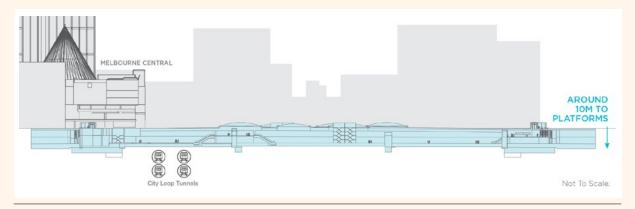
Swanston Street alignment tunnel (Melbourne Metro Rail Authority, 2015a)
